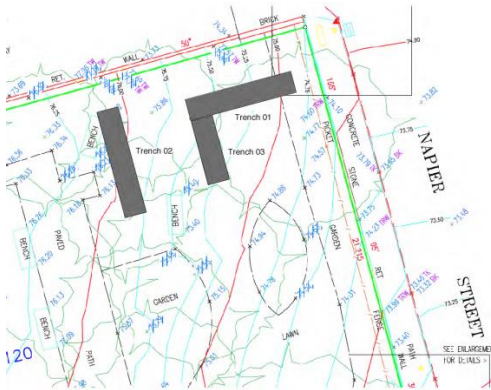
Detail of site survey plan showing the location of the three test trenches excavated by Edward Higginbotham & Associates in 2015.
